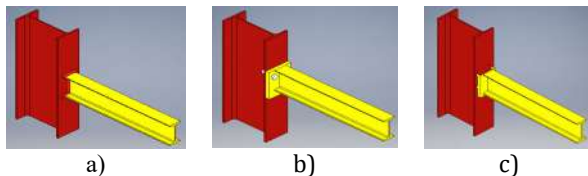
Non - adjustable arm system: a) welded arm, b) bolted arm, c) hooked arm
